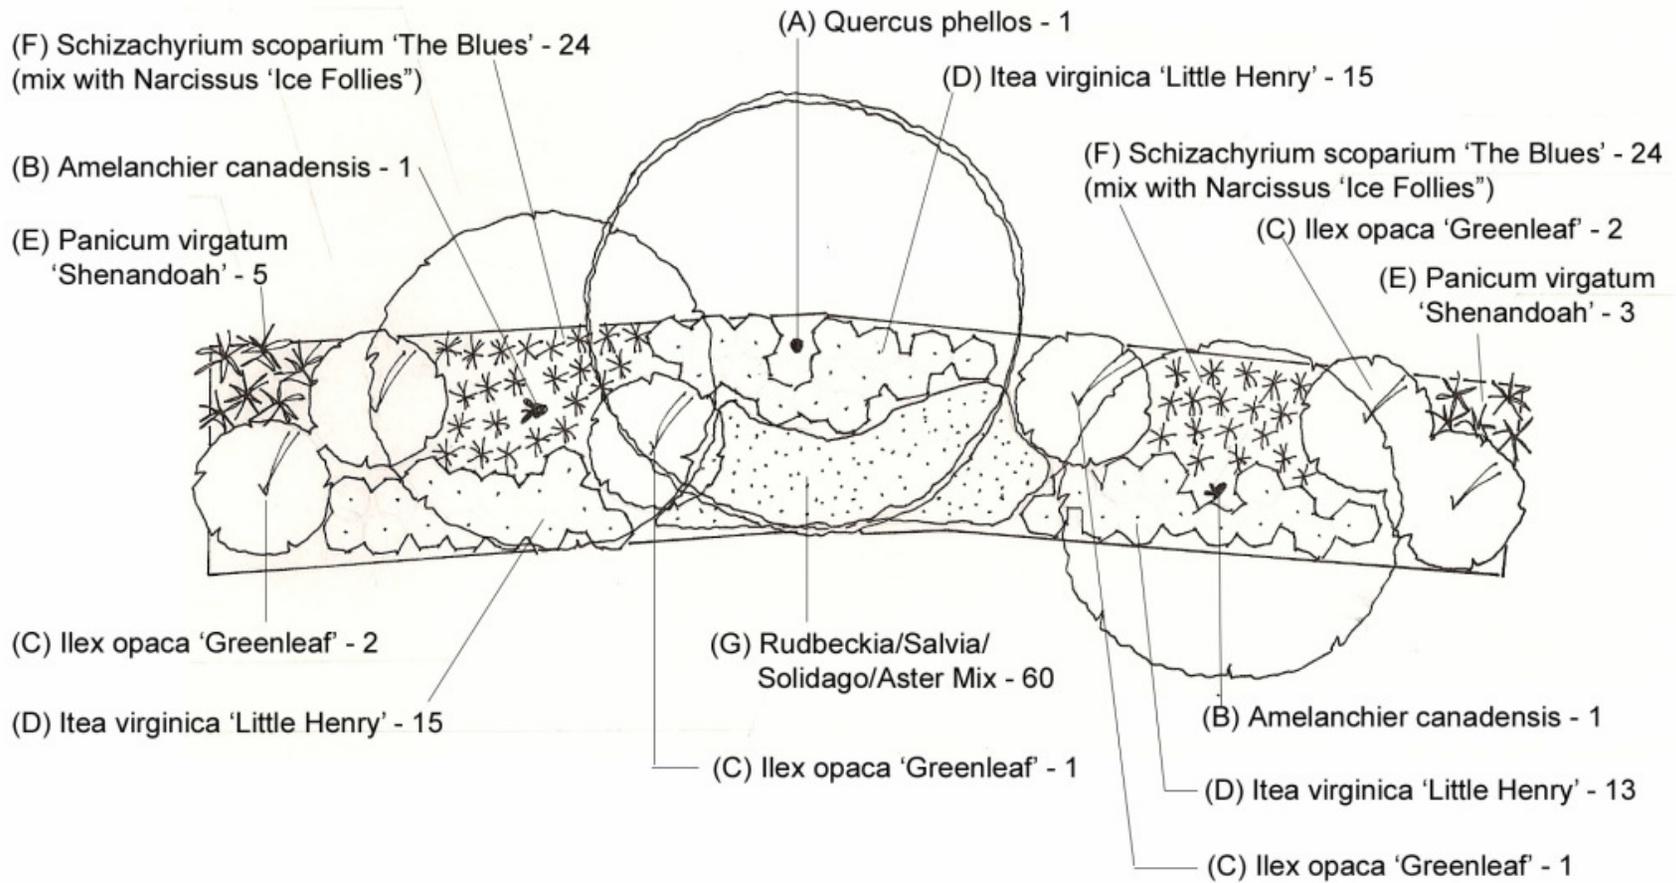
Planting list and layout for the structural soil infiltration trench. Drawing not to scale.
